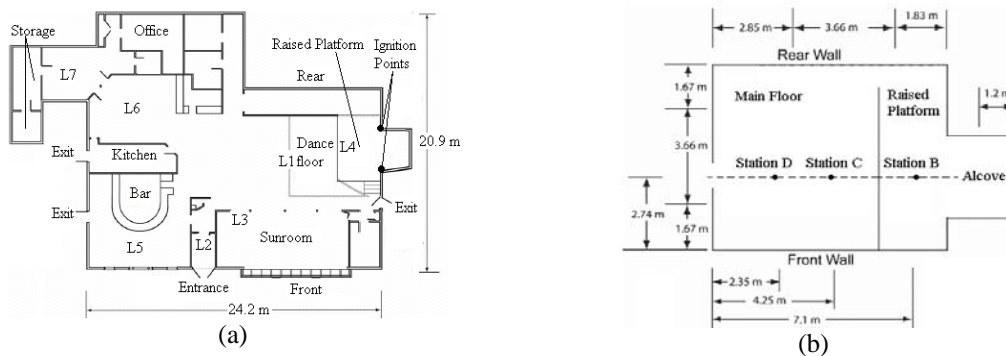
(a) Floor plan of the nightclub; and (b) top view of the test compartment [1]
